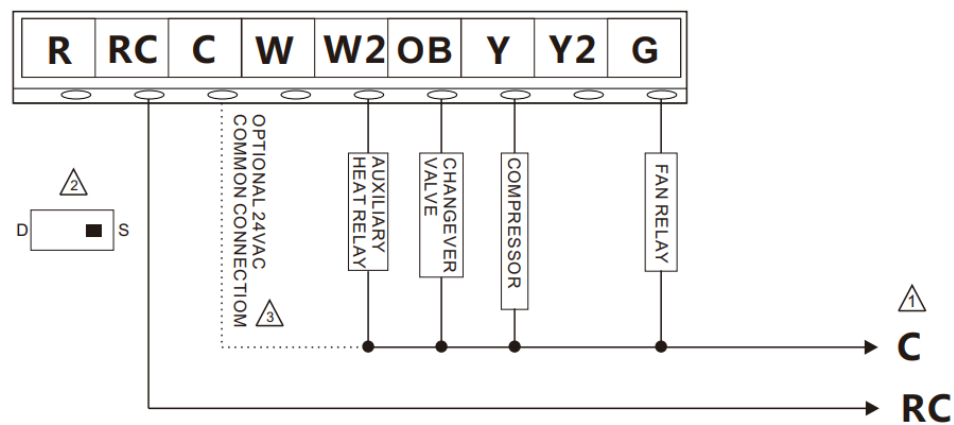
One-stage heat & cool in heat pump (with auxiliary heat)
